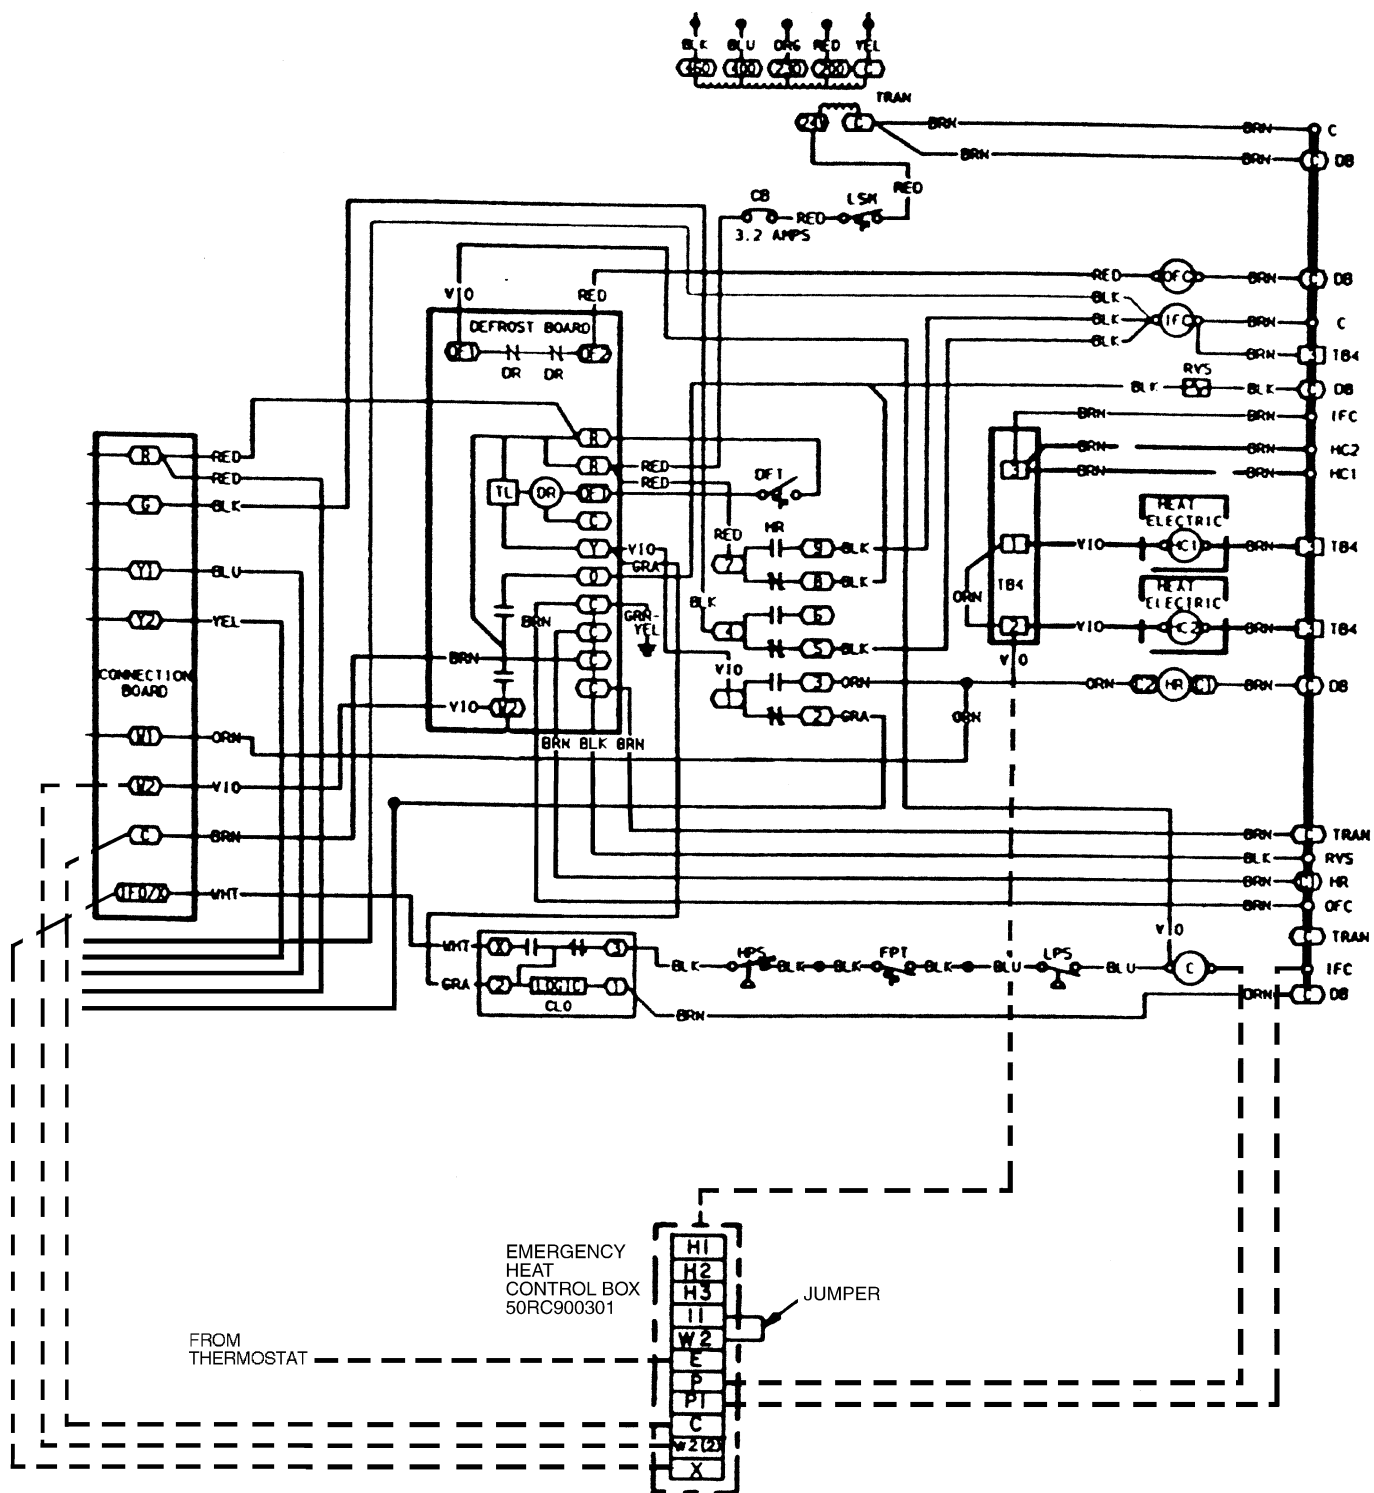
Emergency Heat Control Wiring With Single-Stage Electric Heater and Single Compressor, 50TFQ004-007
